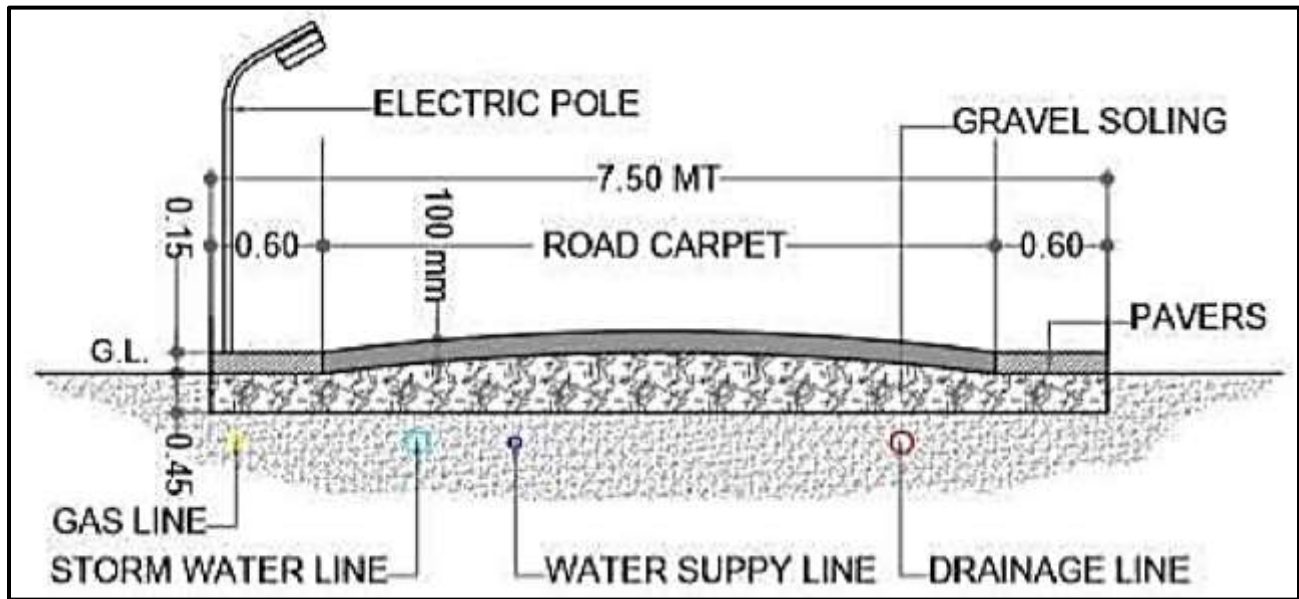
Section of 7.50m Wide Road (Single Lane)
